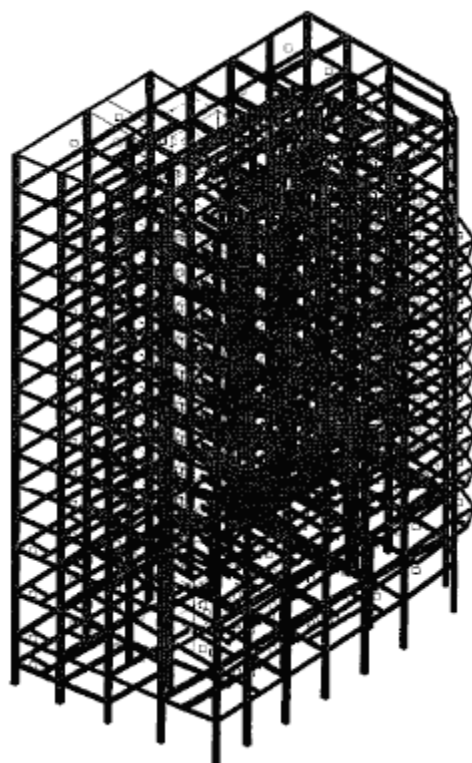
Steel frame of the proposed 15-storey Holiday Inn building at Ameeneege.
